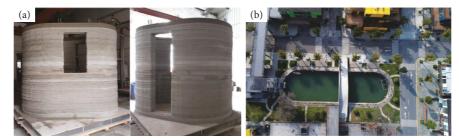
Concrete 3D printing room (a) [62] and concrete 3D printing walking bridge (b) [61].
